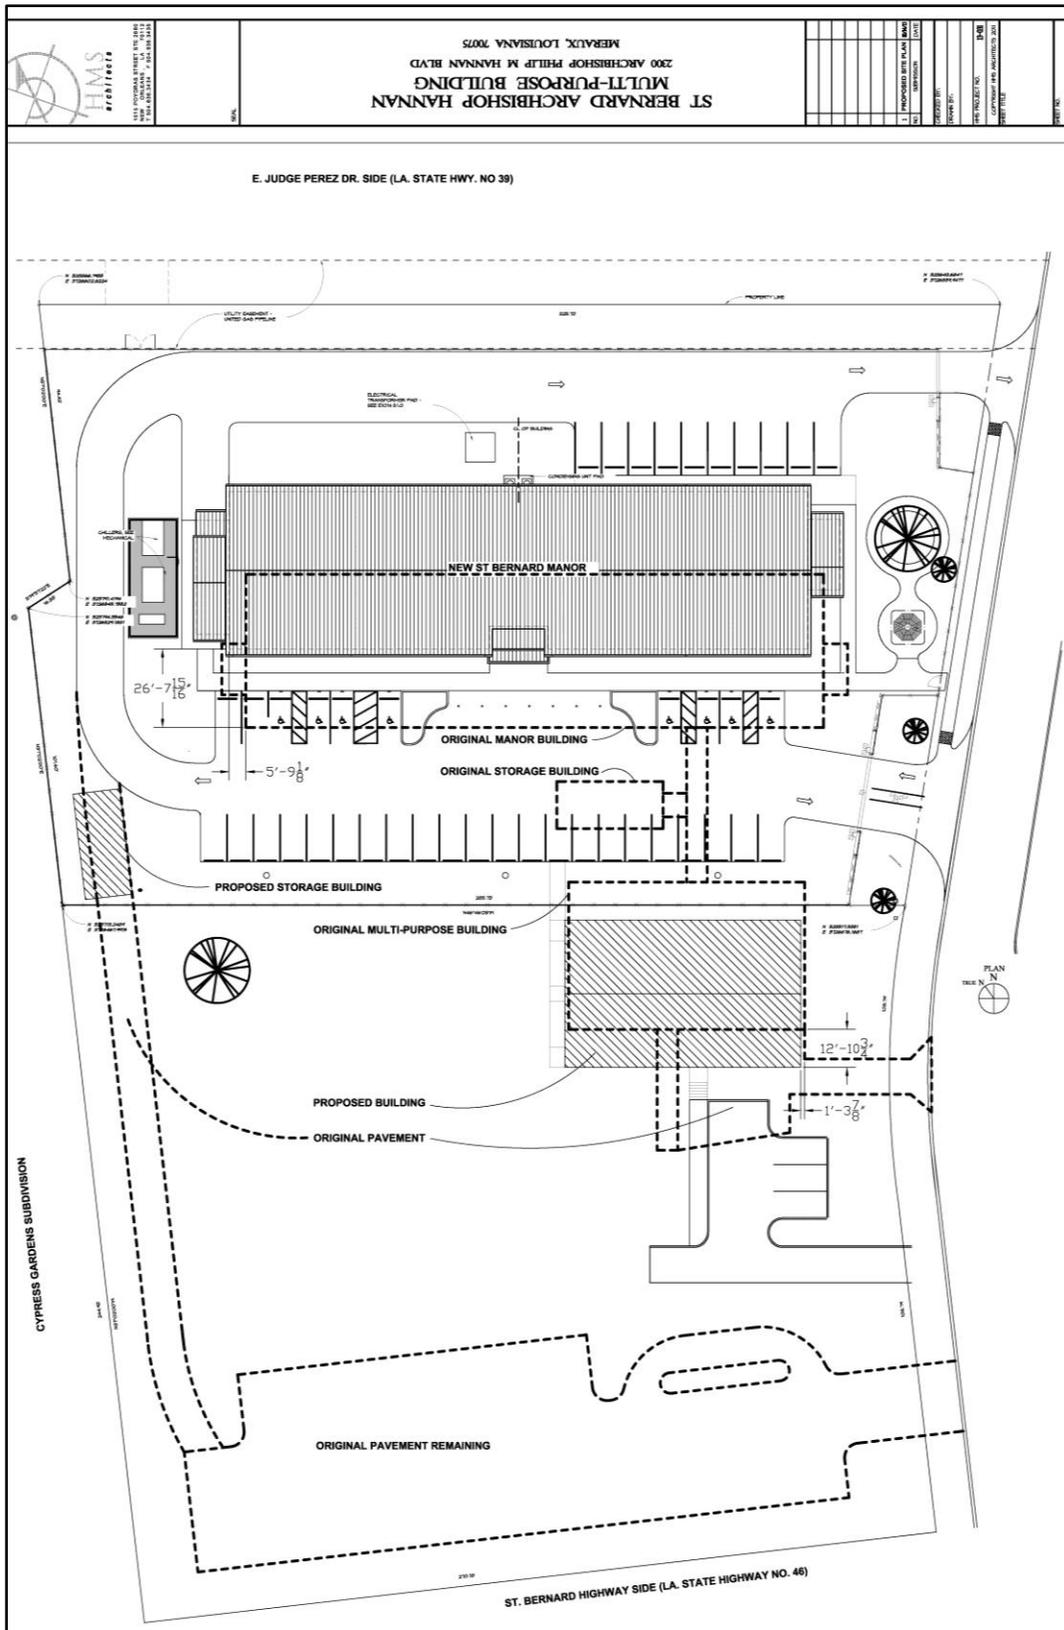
St. Bernard Manor-proposed site layout of multi-purpose building and maintenance building at location B
